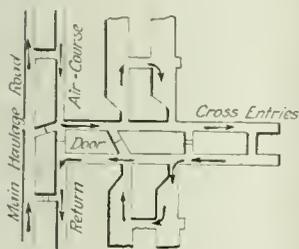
SHOWING ORIGINAL PLAN AND VENTILATION
